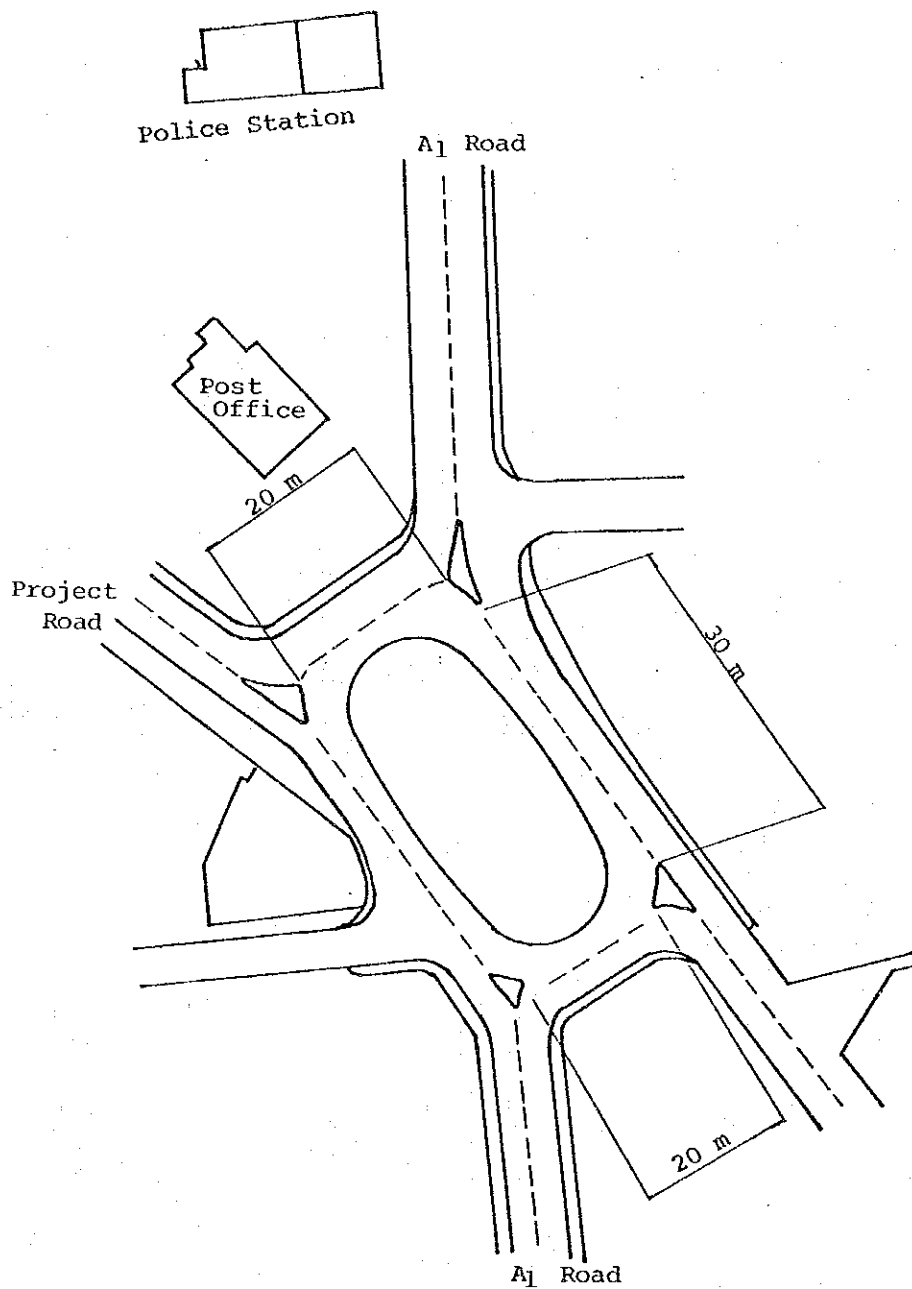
An Improvement Plan of the Beau Bassin Roundabout
